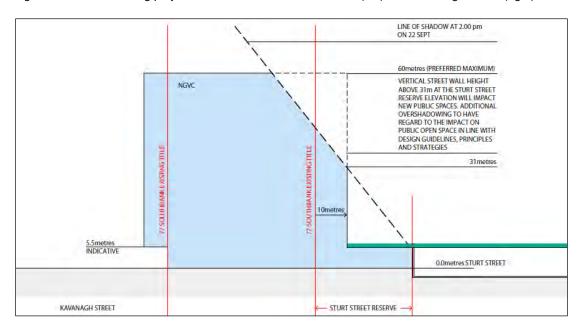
NGVC building projections over Kavanagh Street (left) and Sturt Street elevated deck (right)
